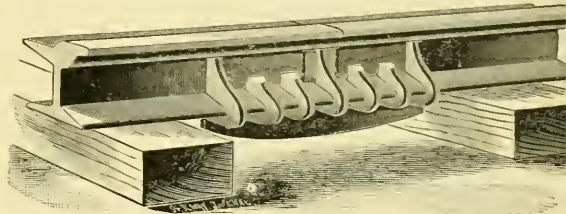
RAIL JOINT BRIDGE IN POSITION.
